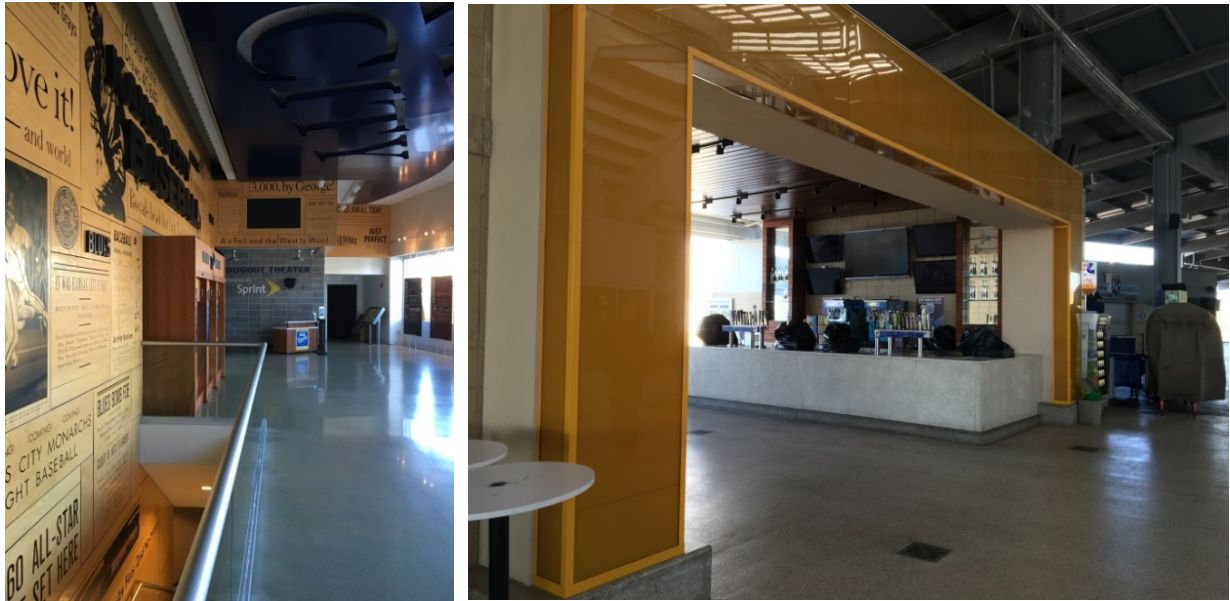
Sealed Concrete Flooring (left) and Epoxy Topping (right)
